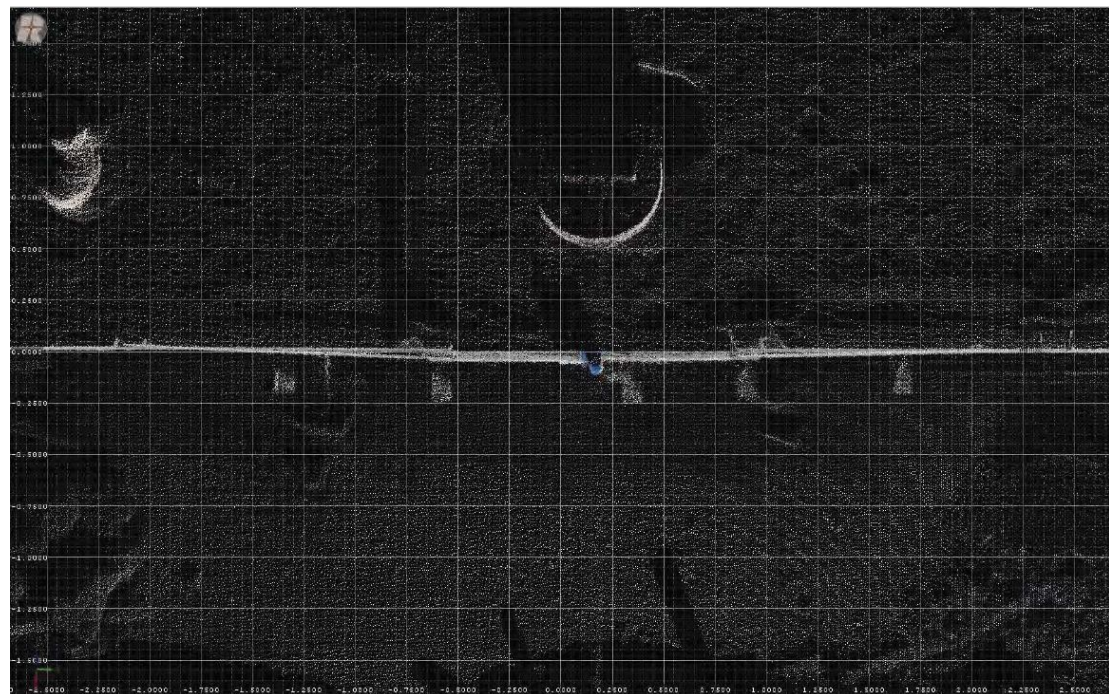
LIDAR plan views of the drilled shaft and the wall at the end of the test
